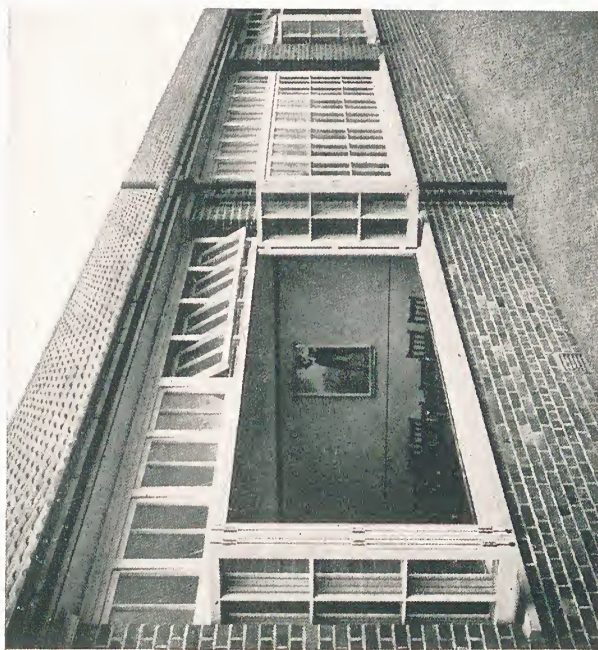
ESAVIAN SLIDING WINDOWS IN A
